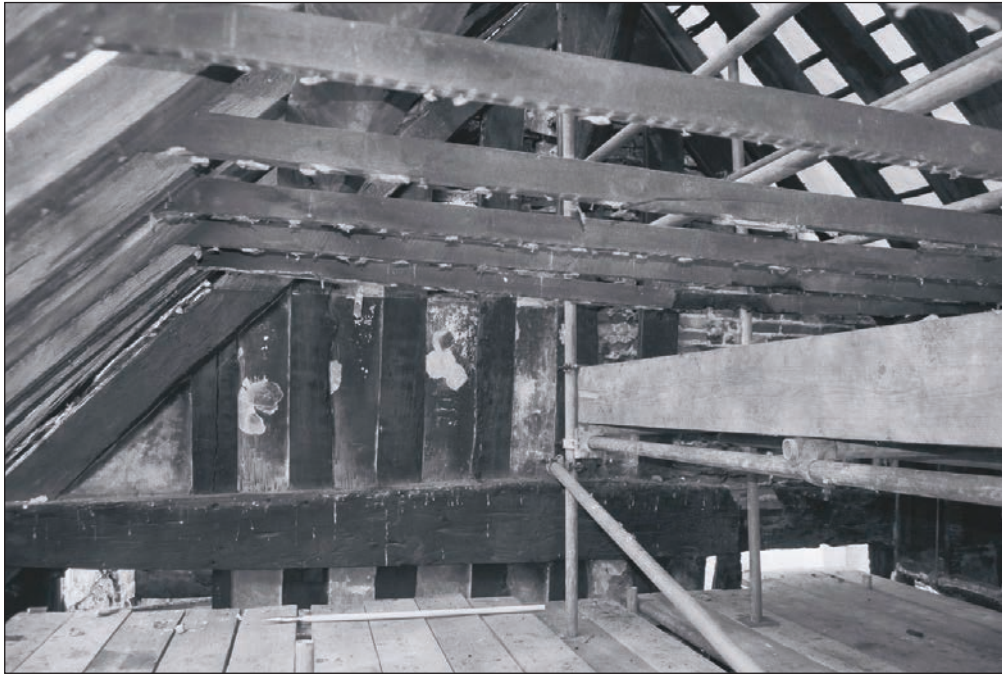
General view of ceiling and roof structure during watching brief, F3, Building 2 (Film 41.11)
